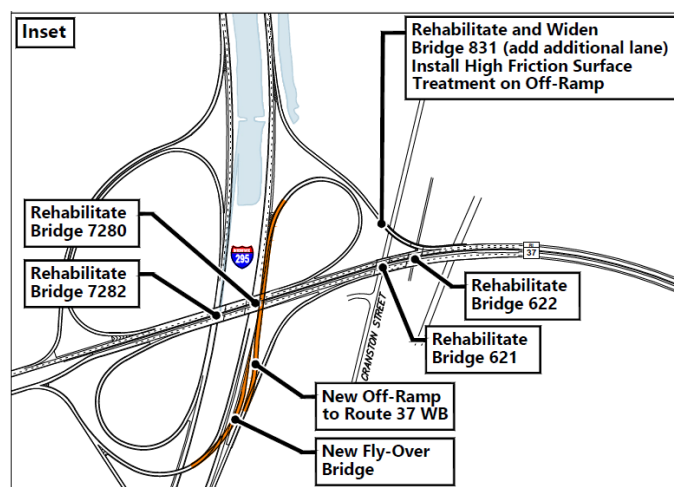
PROPOSED RAMP AND BRIDGE IMPROVEMENTS SUMMARY
